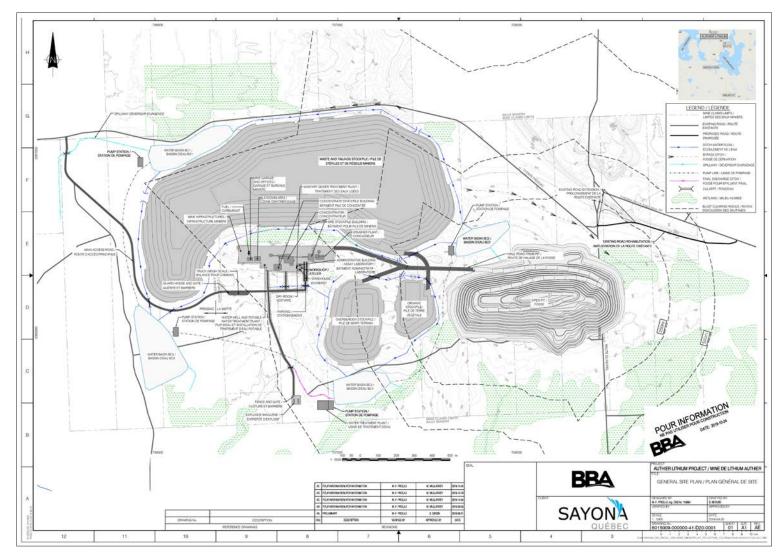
Location of the Tailings and Waste Rocks Storage Facility
